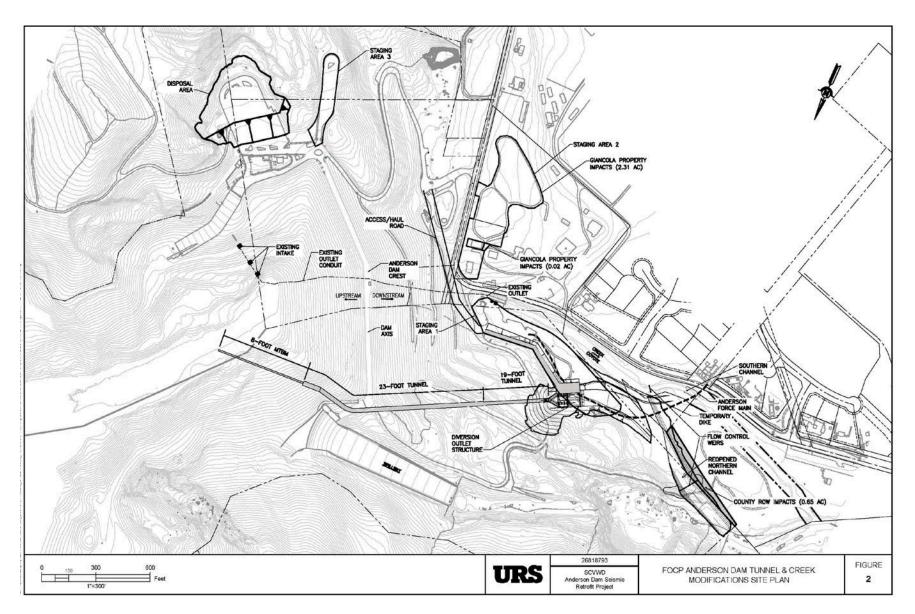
FOCP Anderson Dam Tunnel and Creek Modifications Site Plan
